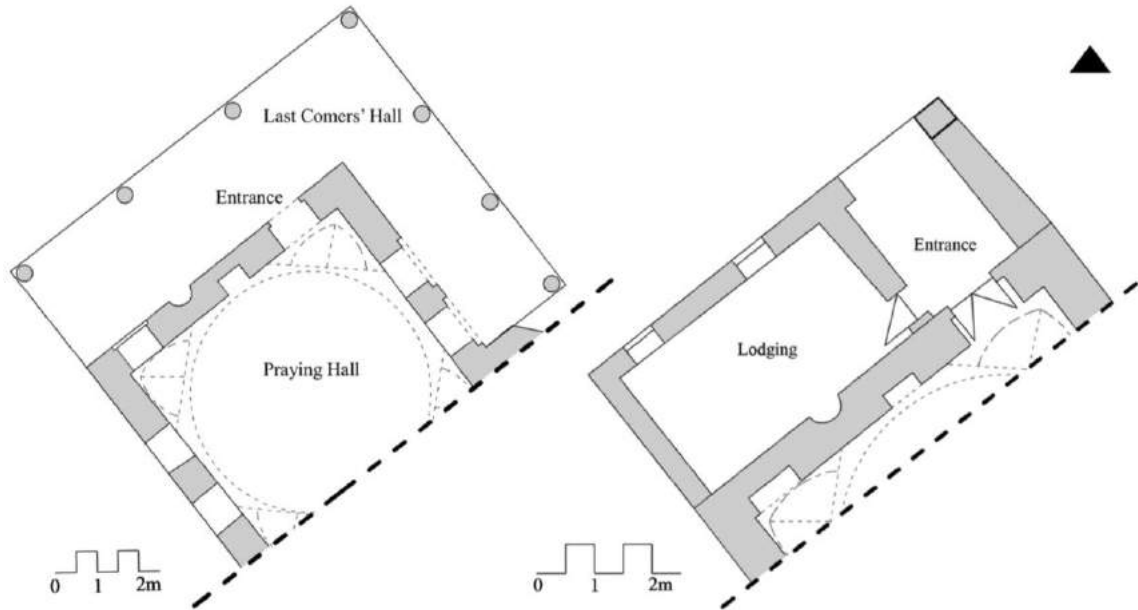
Last Comers' Hall's First Construction Plan (left) (Source: Ünal and Çağlıtütüncügil, 2016: 63) and plan in 1988 (right) (Source: Revised from Akyıldız, 1988: 93)
